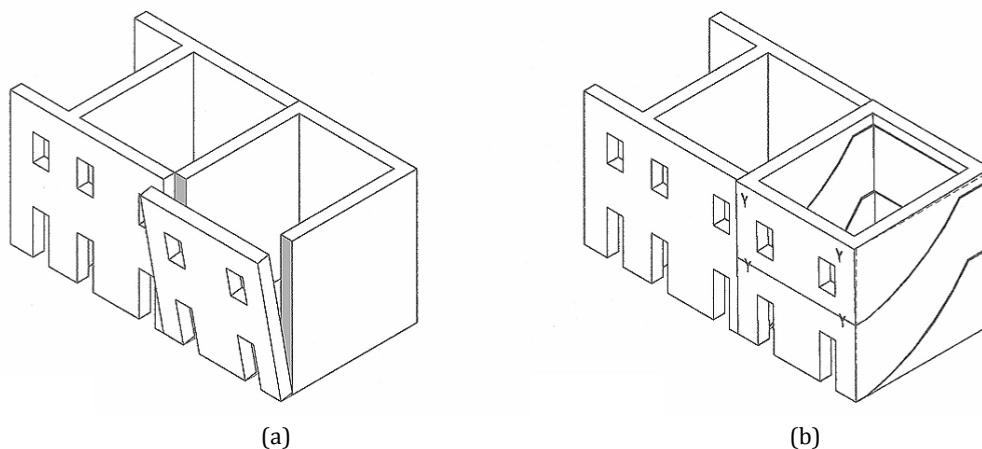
Failure modes of URM buildings (from [24]): (a) Local failure; (b) Global failure
